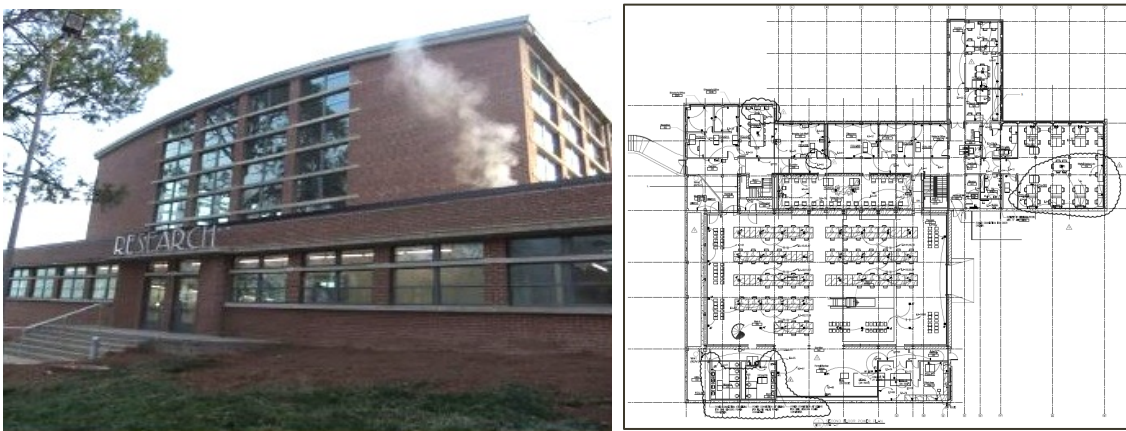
Elevation of typical floor plan of the fifth case building: Hinman
